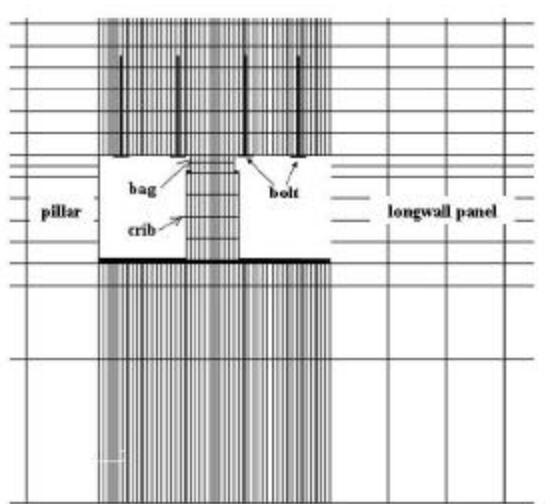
Cross section of the finite element mesh of the longwall tailgate sub-model section.
